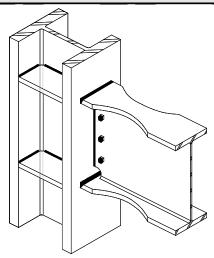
Typical RBS Connection (Ref Englehardt)
